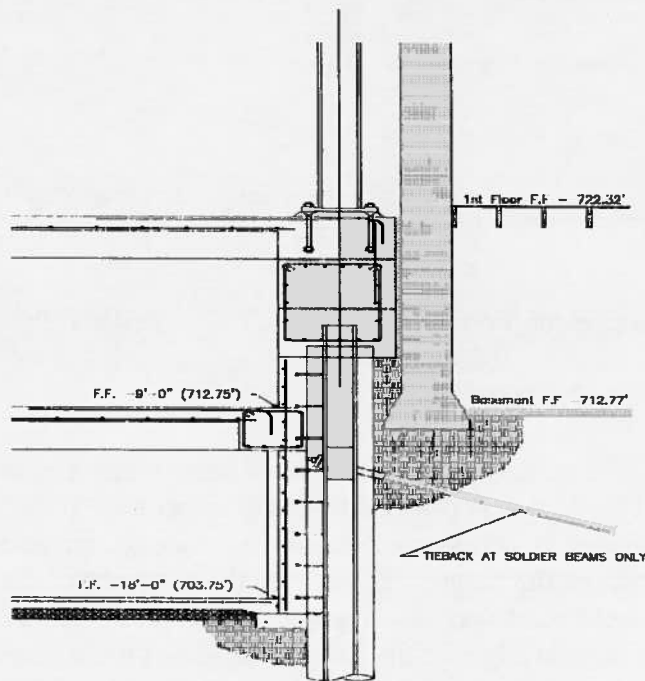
Typical Section at Soldier Beam at Marsalla Building
